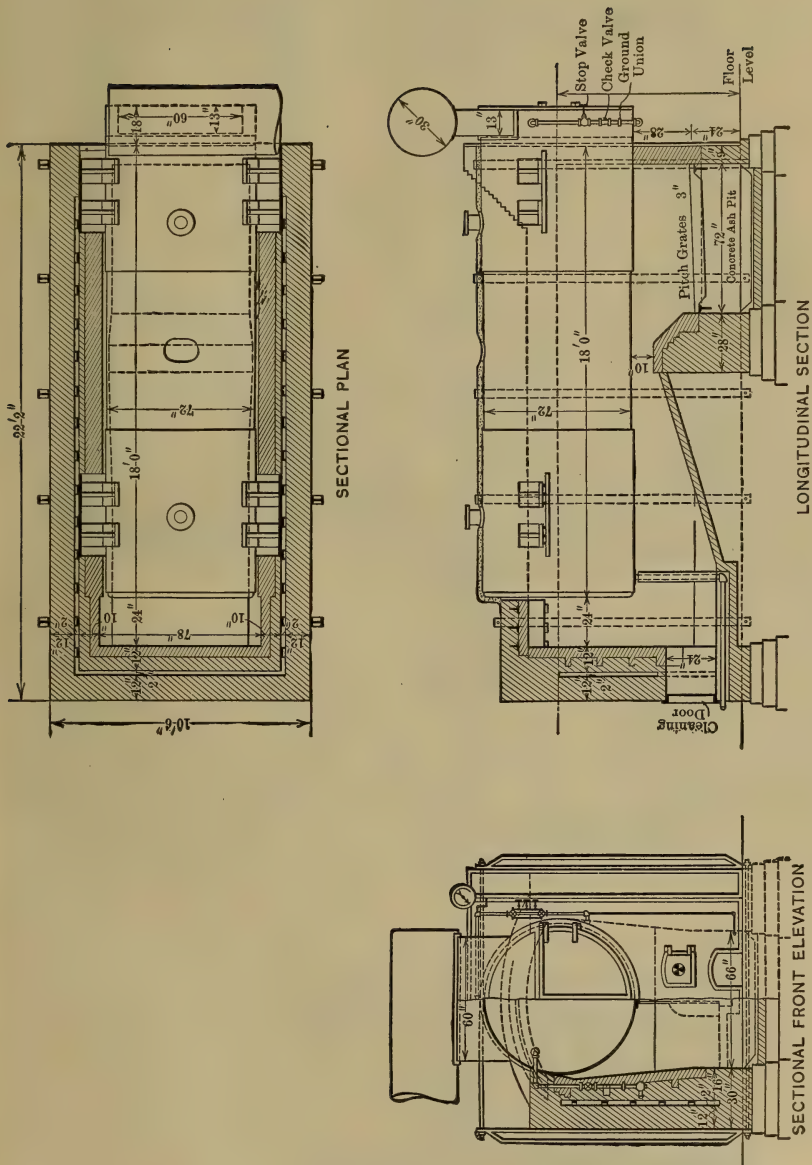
Return Tubular Boiler Setting — Extended Front.
